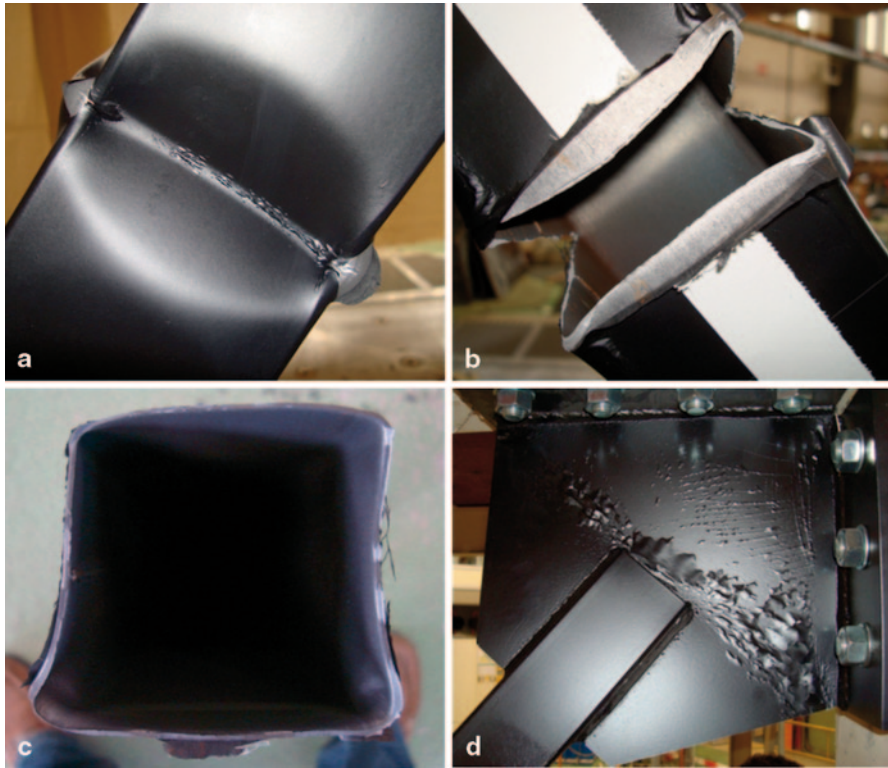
Images of specimen deformation and fracture. a local buckle at brace mid-length with initial tear; b incomplete fracture of brace; c deformed shape of brace cross-section after local buckling and fracture; d yield pattern in gusset plate with SLC detail
